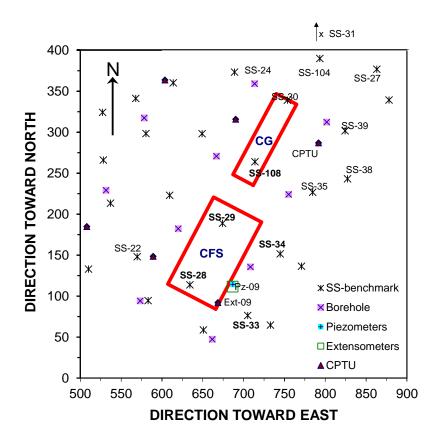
Locations of CFS and CG buildings and layout of field instrumentation
